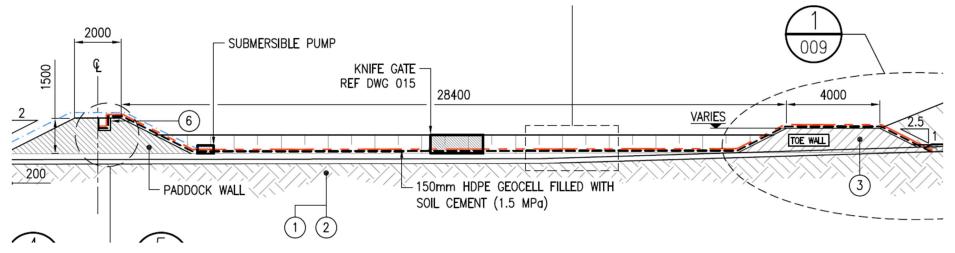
Typical detail of TSF Paddocks and Clean and Dirty Trenches
